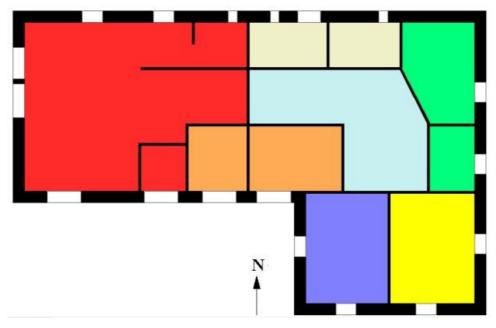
Ground floor plans of the straw-bale building and the virtual brick building coloured by zones
